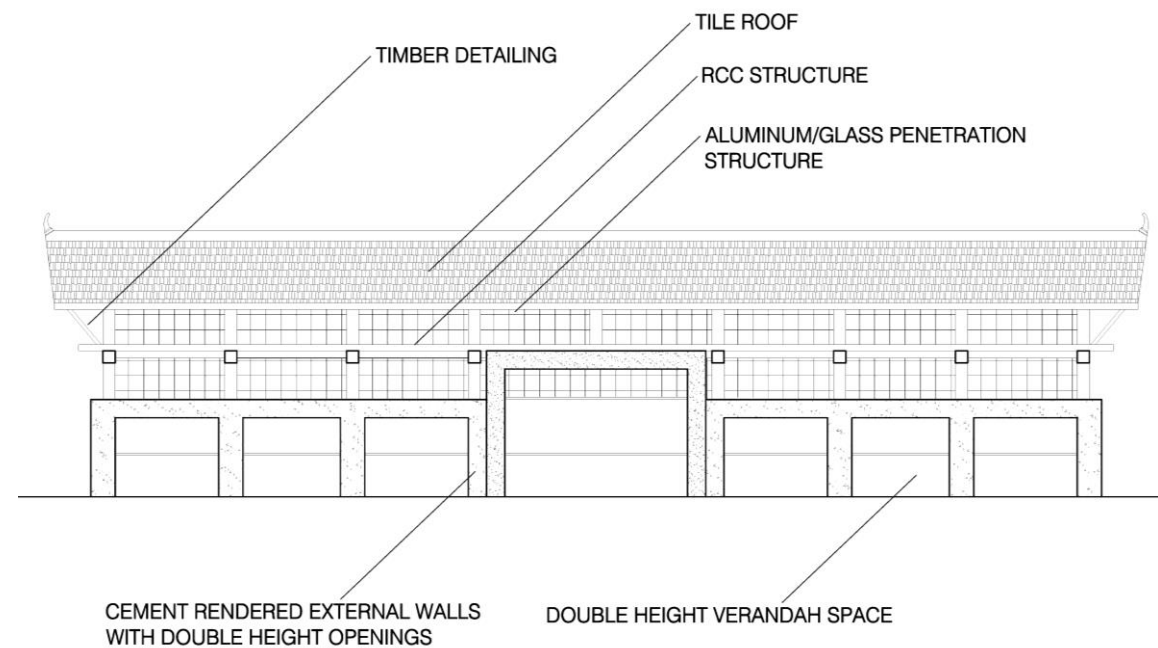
Typical Front View of a Building proposed for Vantharumoolai Main Campus
